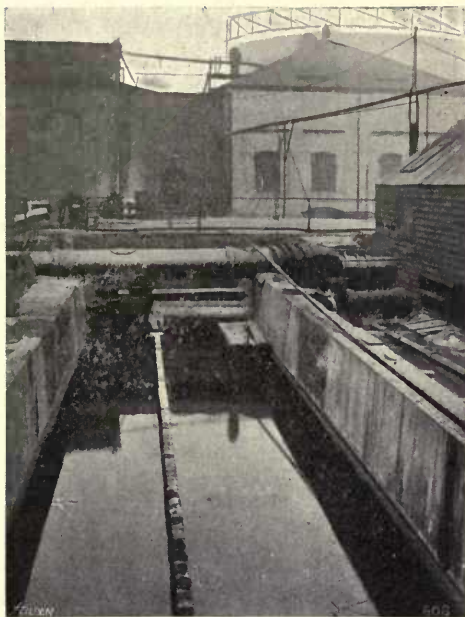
WATER CONDENSERS AT THE OLD KENT ROAD STATION, SOUTH METROPOLITAN GAS CO.
